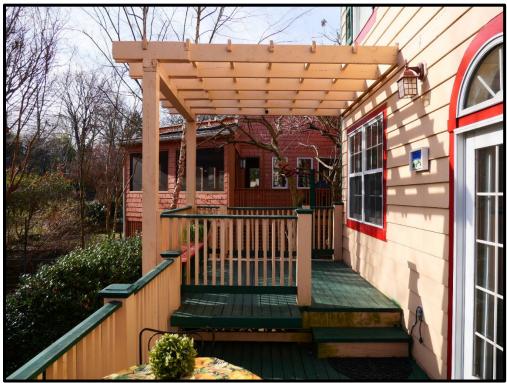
The porch will be built on the elevated portion of the existing deck with trellis. The trellis will be demolished as part of the project.
